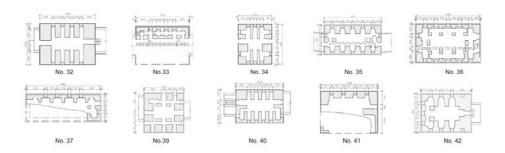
Floor Plans of Towers in Dong-gou Great Wall
